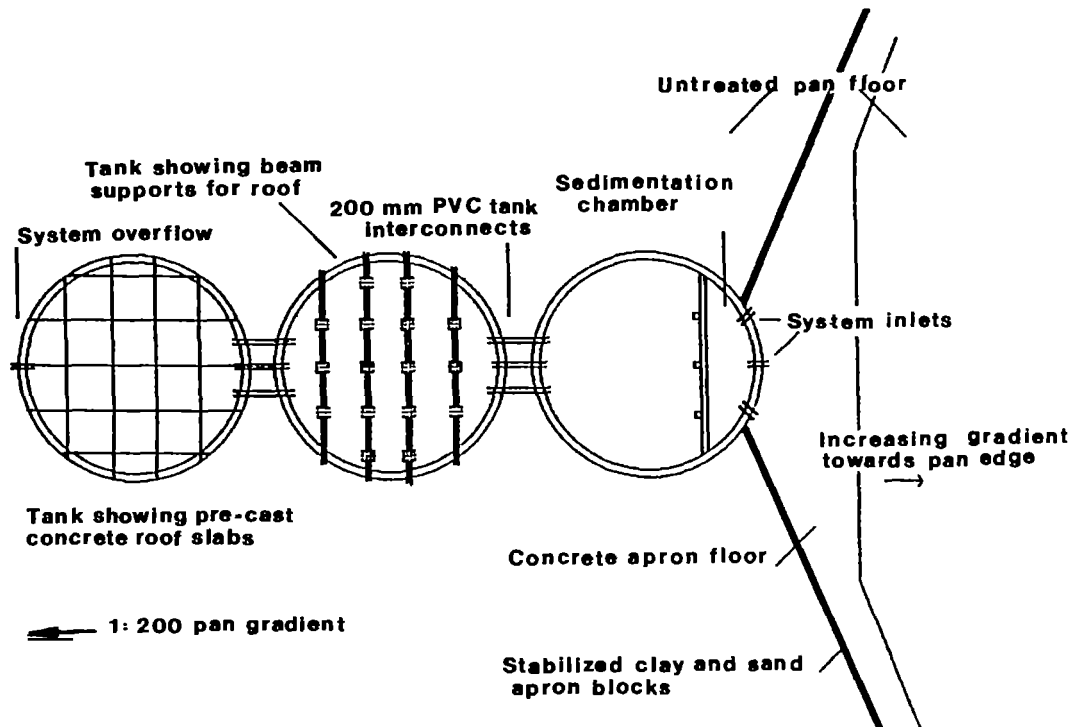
Details of storage tanks. 68m^3 (5.8m diameter x 2.5m); double brick walls (no reinforcing); concrete foundation and floor.
